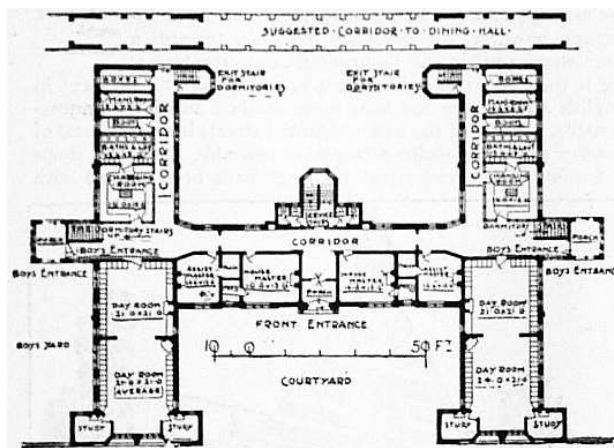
Plan of a Master's House, New Christ's Hospital. (Webb and Bell.)
